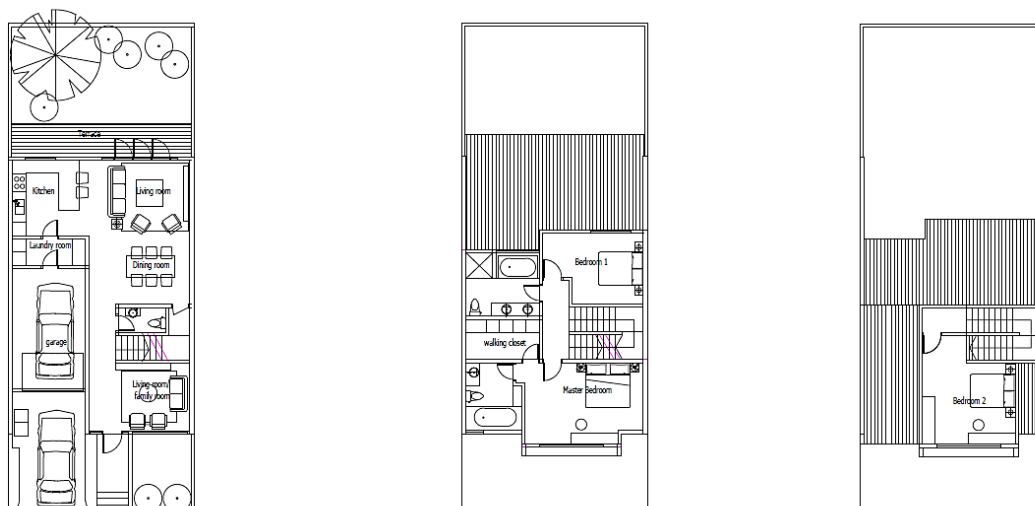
Standard Housing Type 2 (Extract from Buchan Group report)
